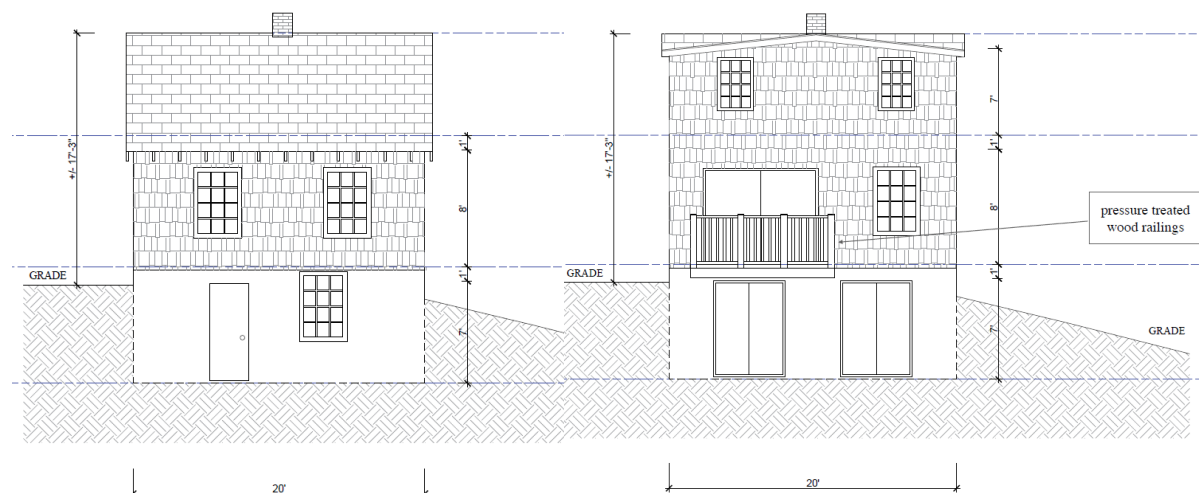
Existing rear elevation (left) and proposed rear elevation (right).
